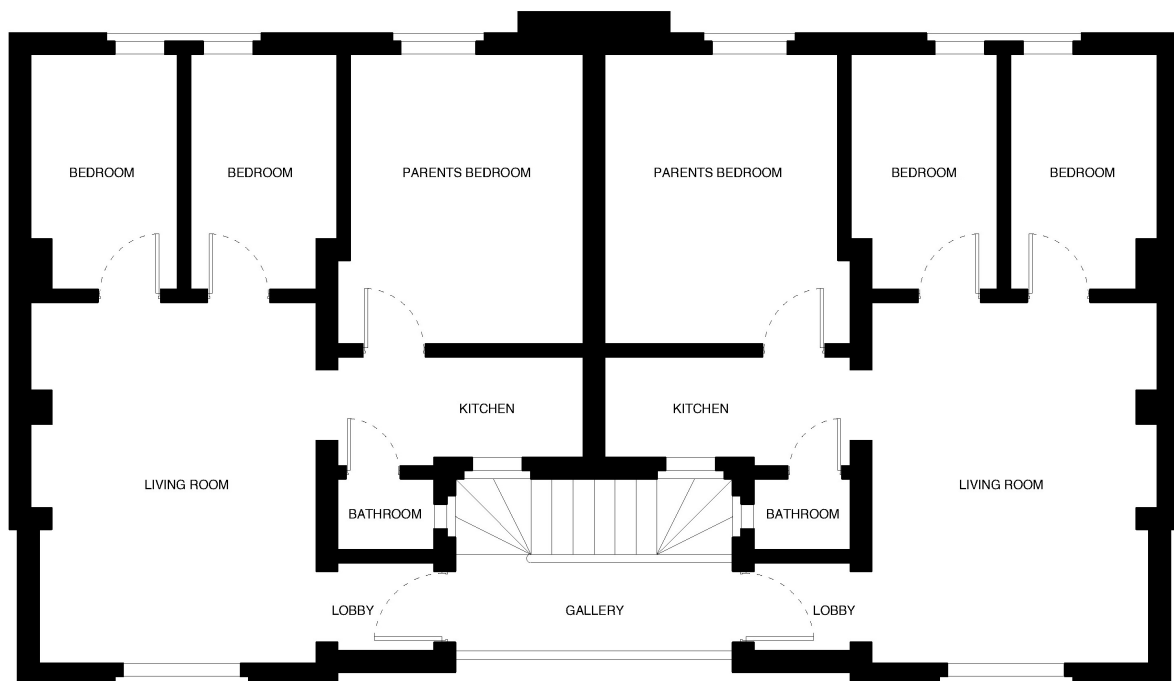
Model Lodging-House floor plan. Source: Drawn by the author from Roberts (1867, p. 121).
